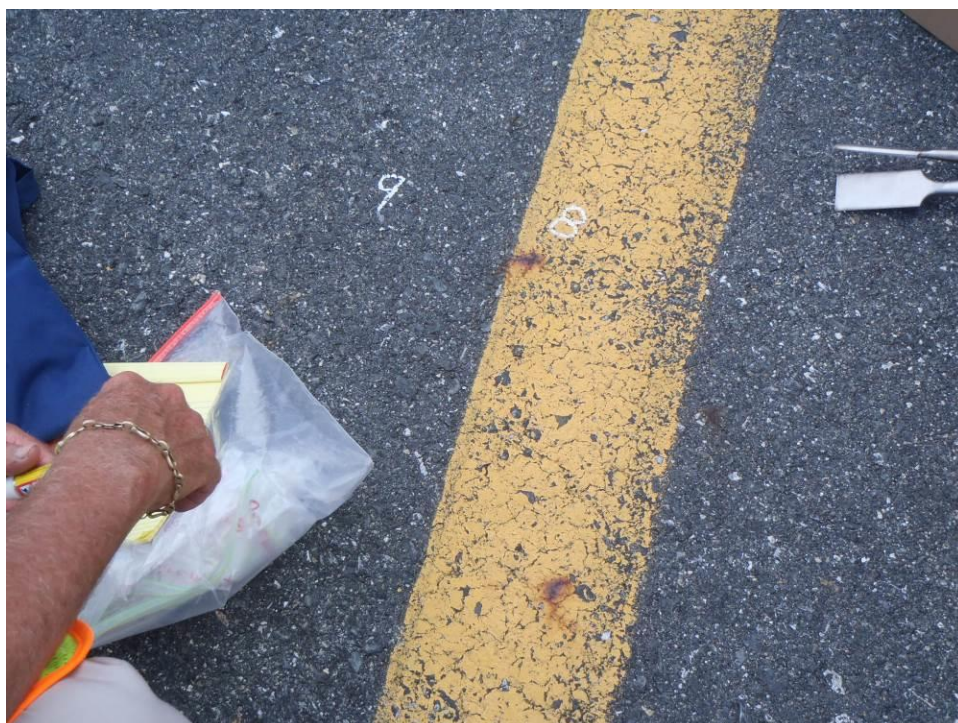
Paint sample locations 8 and 9. Note sample 8 is on a stain and 9 is not.
